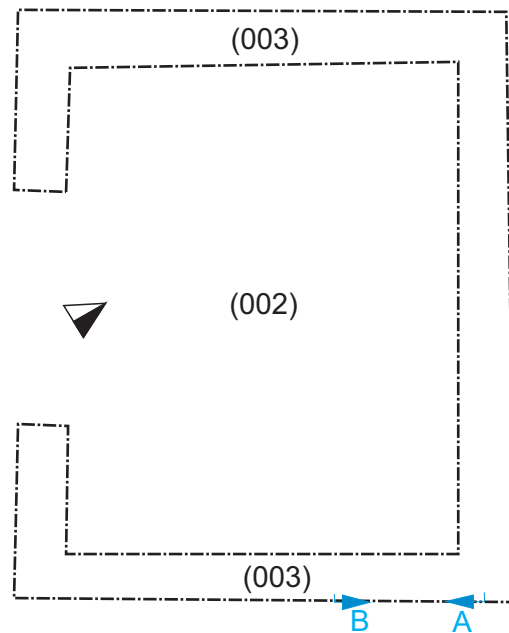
Plan of monitored footings of new house and detached garage. 1:100 @ A4
